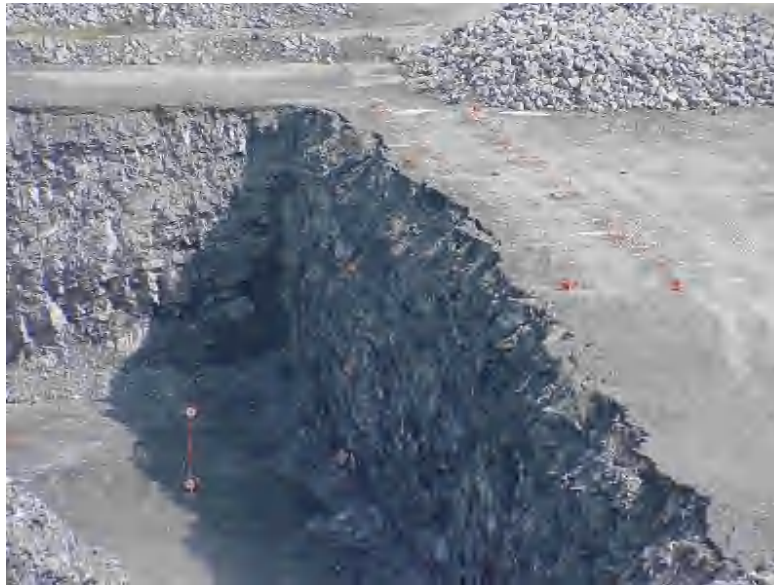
Example of a fully instrumented full-scale shot ready to be fired.
